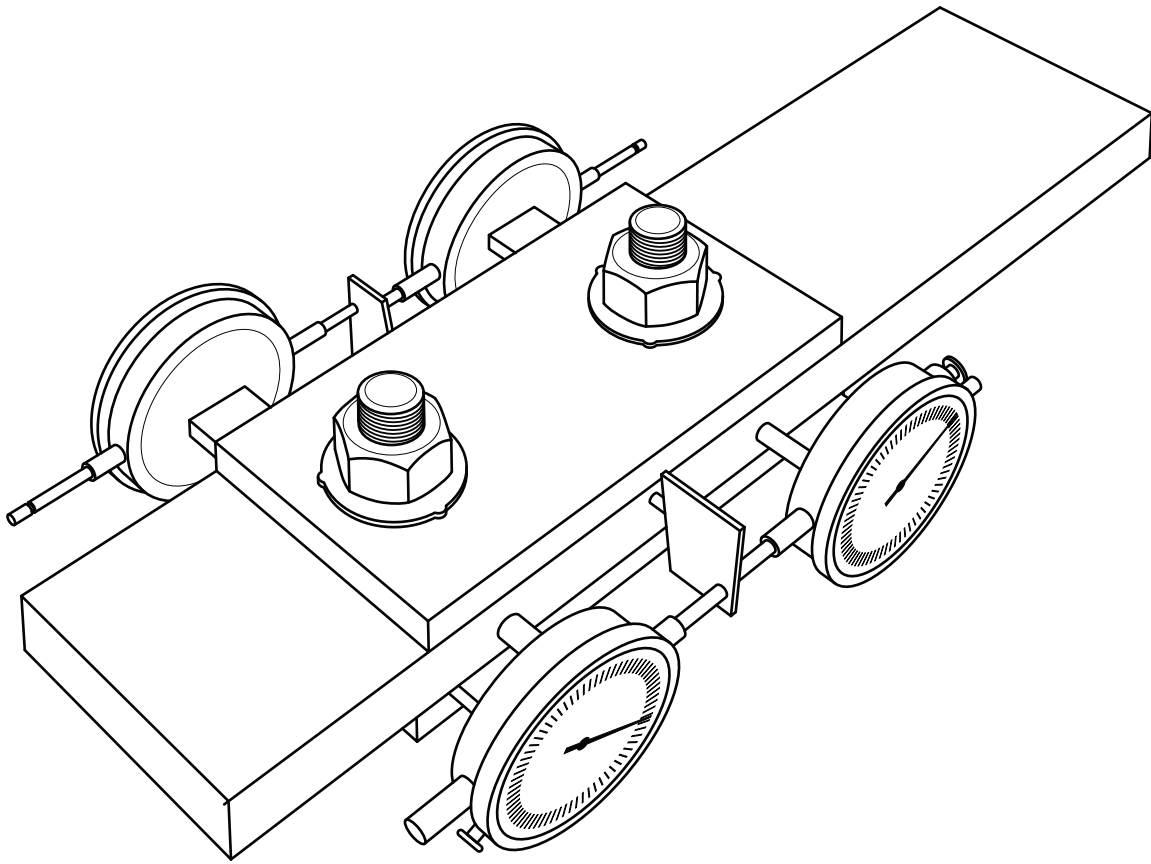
TYPICALLY INSTRUMENTED TEST ASSEMBLY
